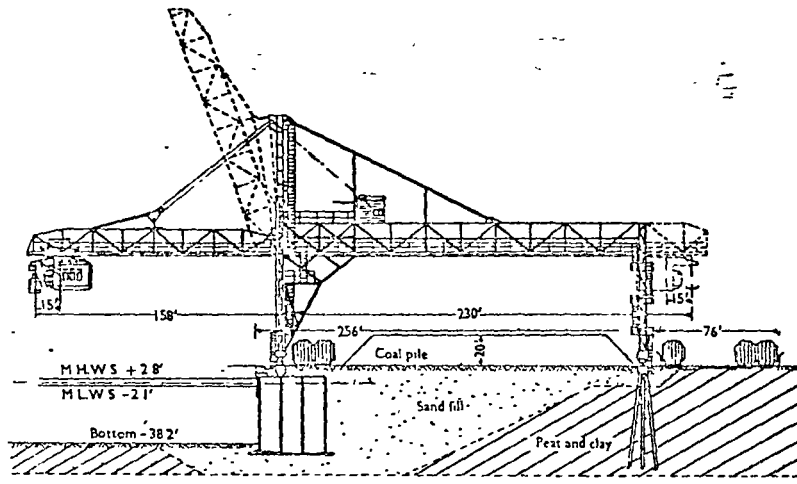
PIER 7 AT WAALHAVEN DOCK
